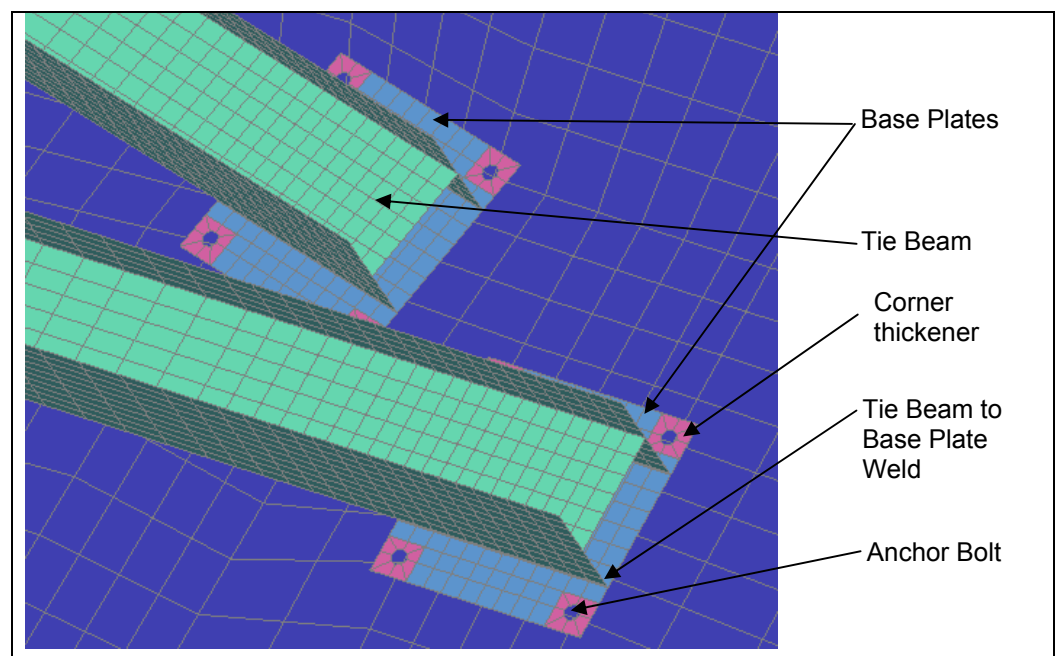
Tie-Beam/Base Plate Connection to Floor Slab. Prepared by Arup.
